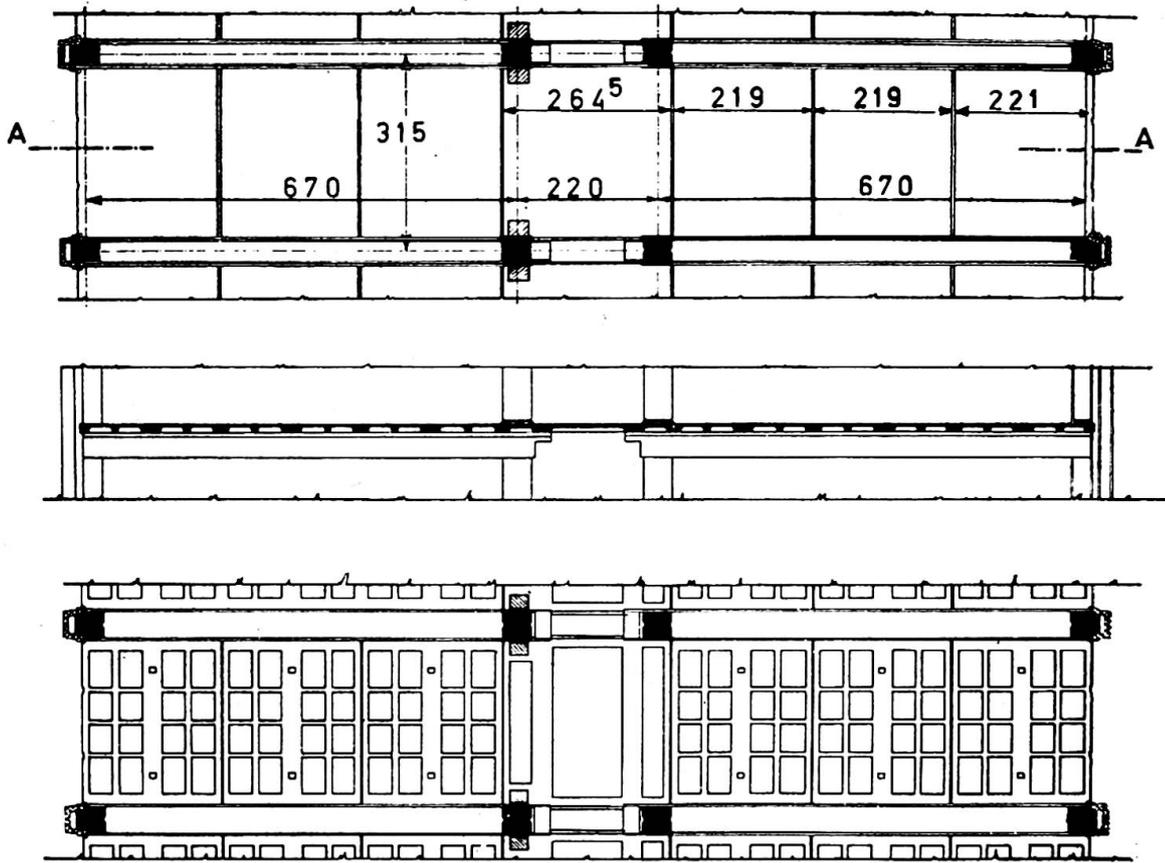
Floor with floor plates. Top view, cross-section, and underside view.
